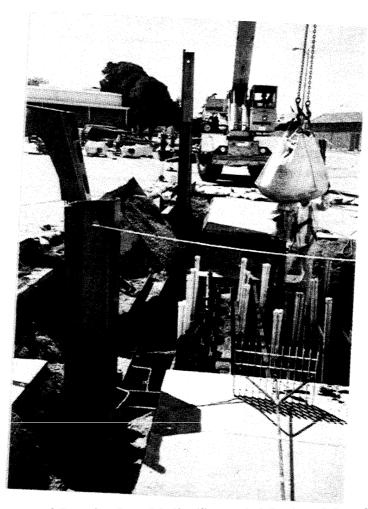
Emplacement of Reactive Iron Media (Suspended Bag) and Pea Gravel (Front-End Loader) into Divided Sections of a Permeable Cell (Courtesy of NFESC and PRC, Inc., 1996)
